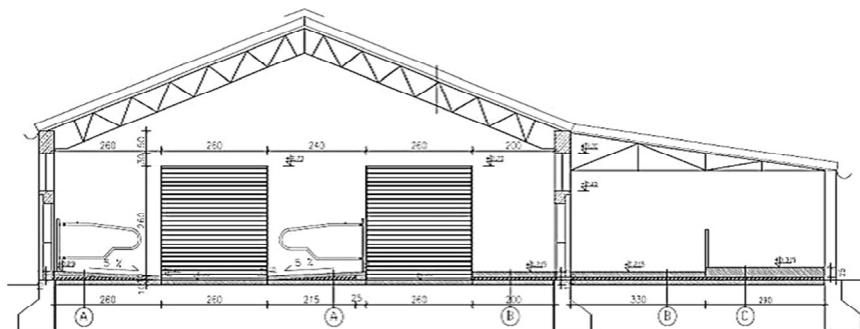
Section through modernized cowshed – option I; roof elements: lattice girders, purlins, sandwich panel
